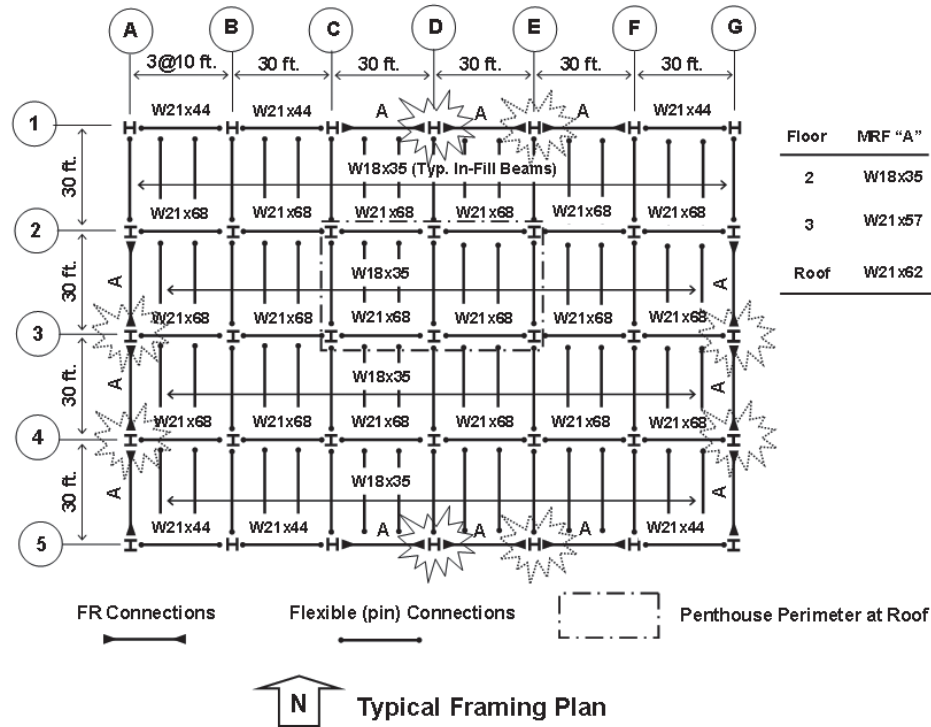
Typical Floor Plan for 3-Story Building [15].
